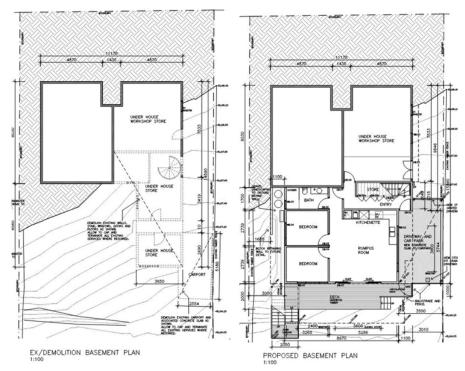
Existing and proposed lower floor plan (Steven Spizick Architect, 2021)
